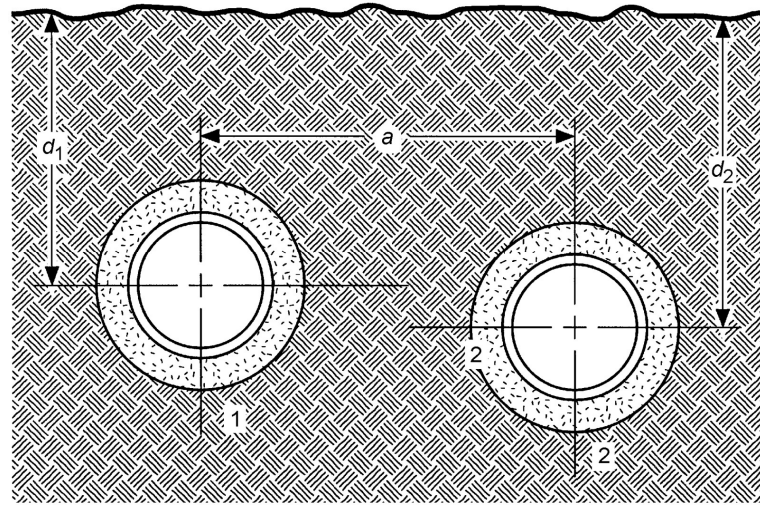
Schematic drawing of a pipeline buried underground (ASHRAE, 2008)
